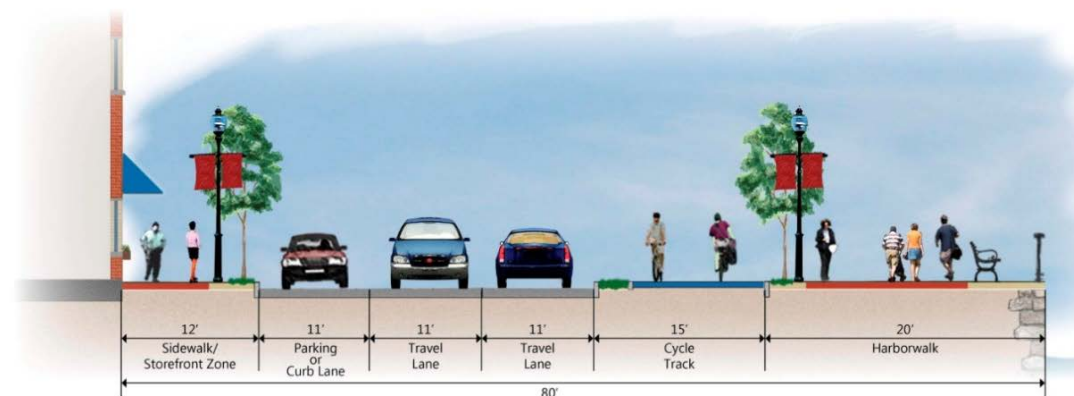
Proposed Dorchester Avenue Section from Seawall to Streetwall
